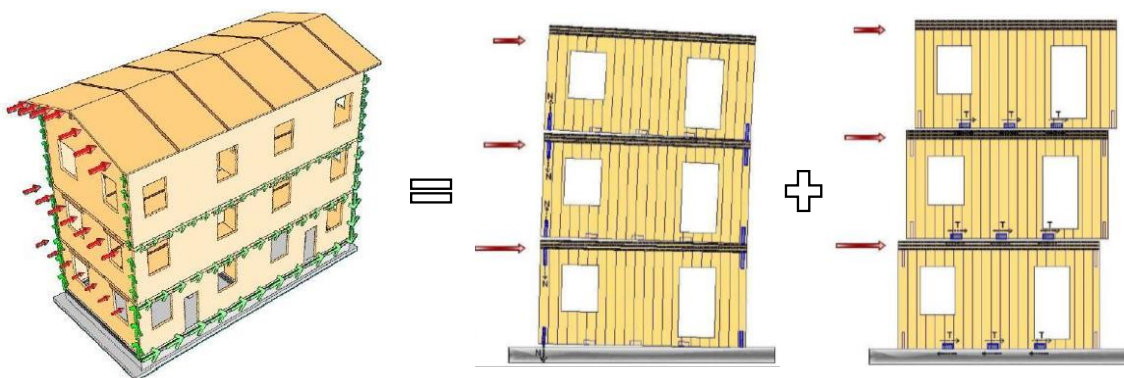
Lateral load path in a platform system and detail of CLT wall consequent deformation
